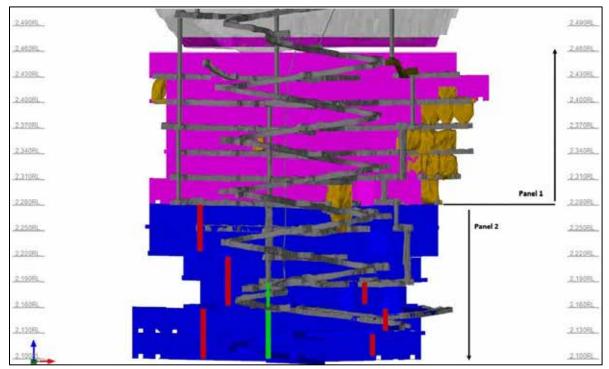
Section View Showing Split Between Panels 1 and 2
